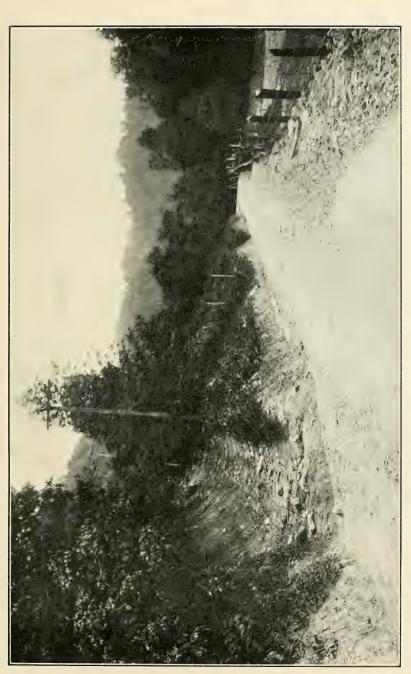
PLATE XX-Showing section of improved macadam road between Welch and Gary, constructed by prisoners, and road replaced at left margin.—Photo by courtesy of W. J. McClaren, Road Engineer, McDowell County.
